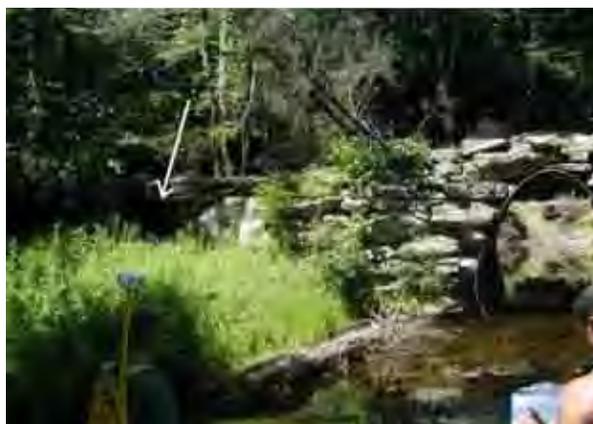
Looking downstream at double culvert Overflow culvert is indicated by white arrow.
